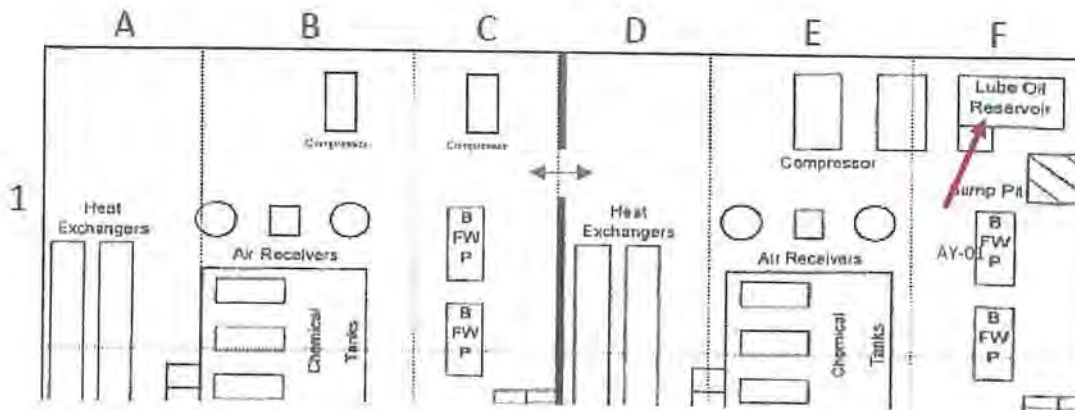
BASEMENT FLOOR DIAGRAM SECTION
